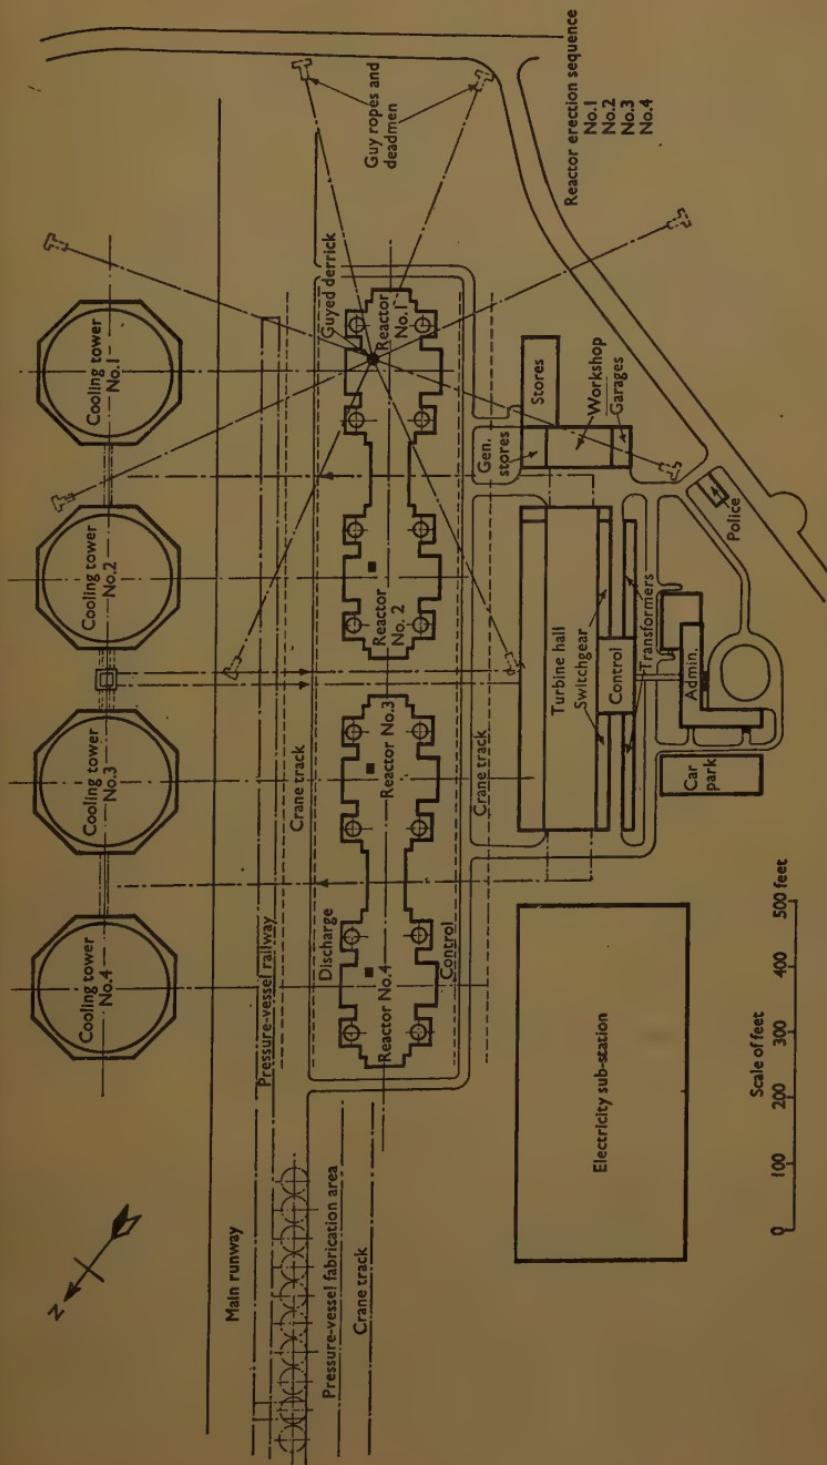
SITE LAYOUT. CHAPELROSS WORKS
